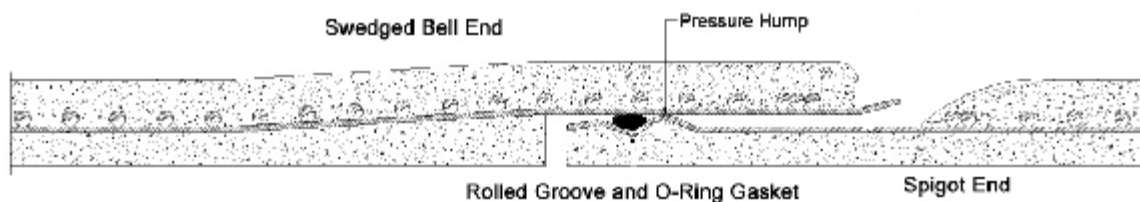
S303™ Rolled Groove Test Joint Profile (not to scale)
